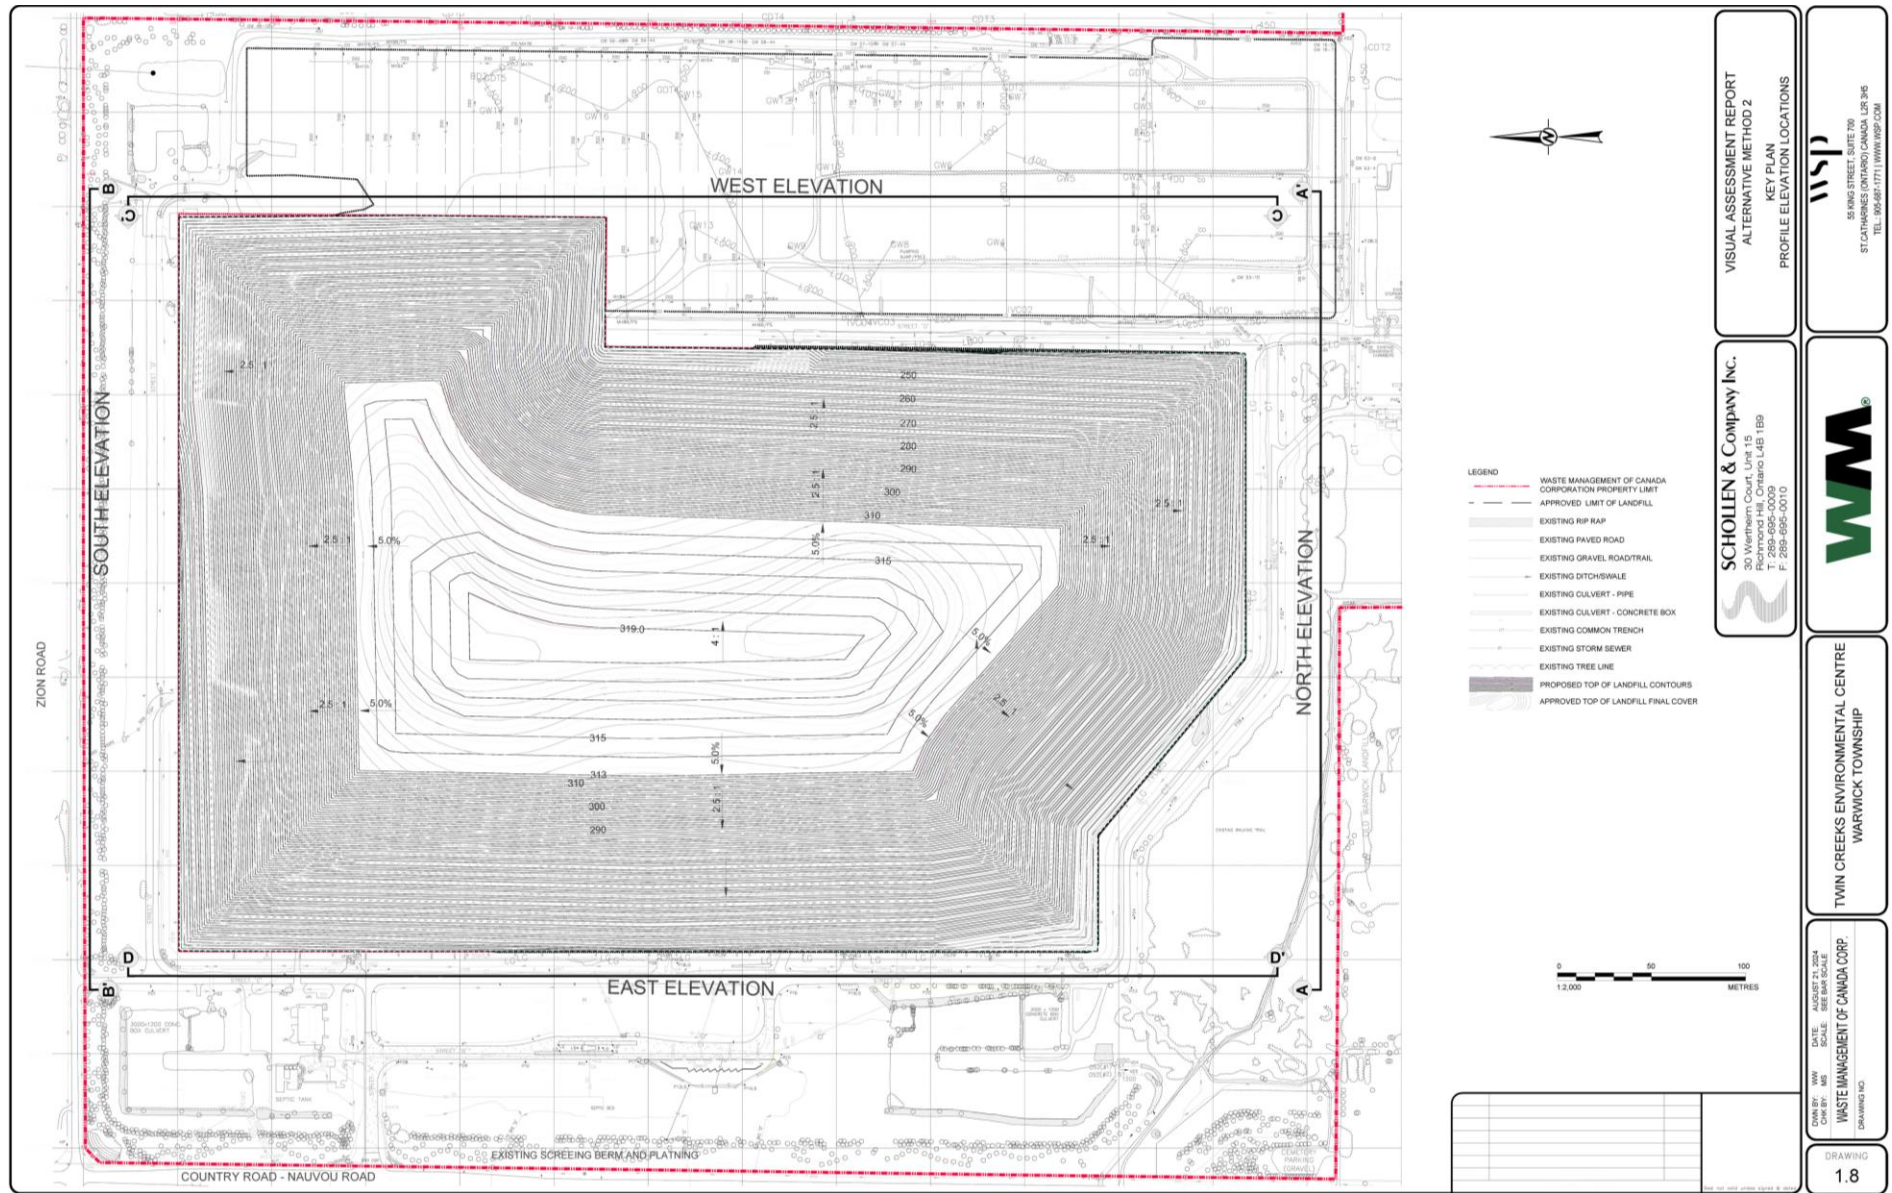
Alternate Method 2 – Key Plan – Profile Elevations Locations
